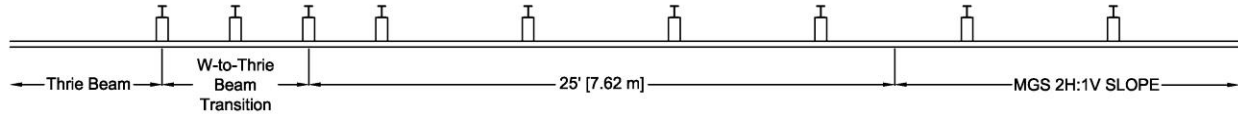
MGS Adjacent to a 1V:2H Slope Offset from W-to-Thrie Beam Transition
